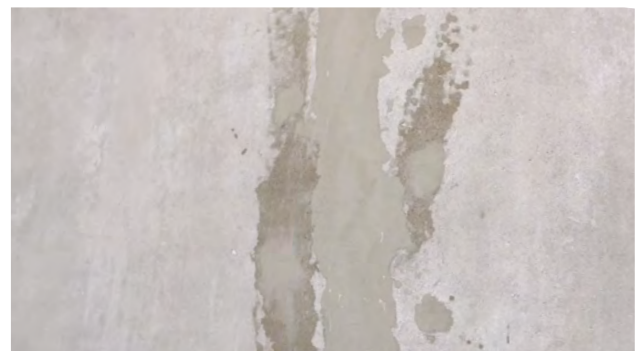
Removal of packers, removal of patching and post treatment of the crack
